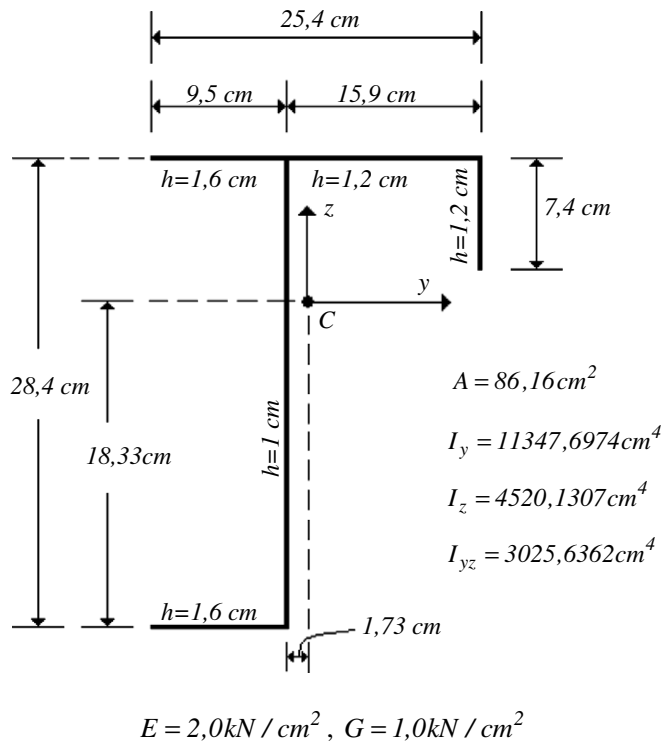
Unsymmetrical welded profile forming the cross section of Example 4.
